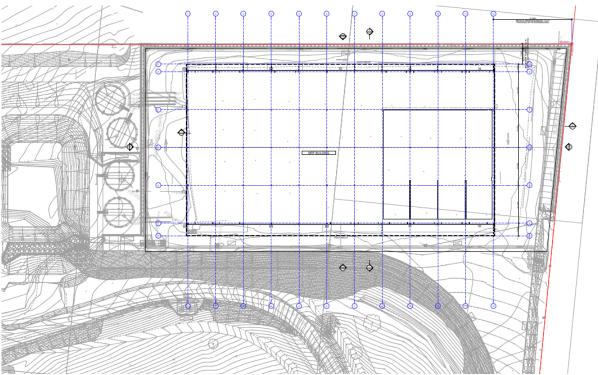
Extract of the Site Plan prepared by MIEngineers.
